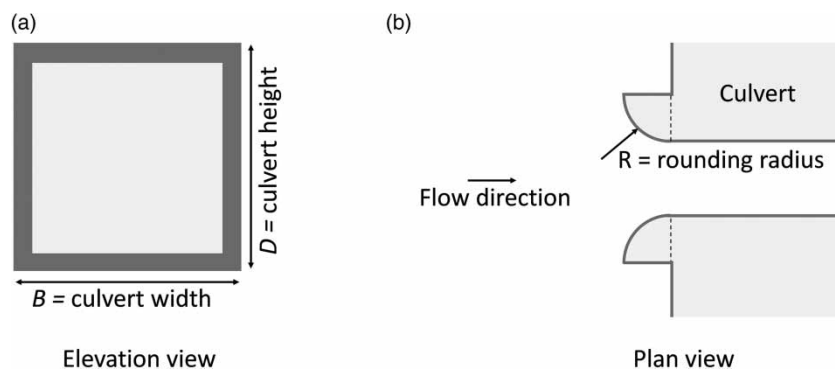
| (a) Elevation view of the box culvert showing the width (B) and height (D) of a culvert, (b) plan view showing the rounding radius (R) for the rounded-edge inlet.
